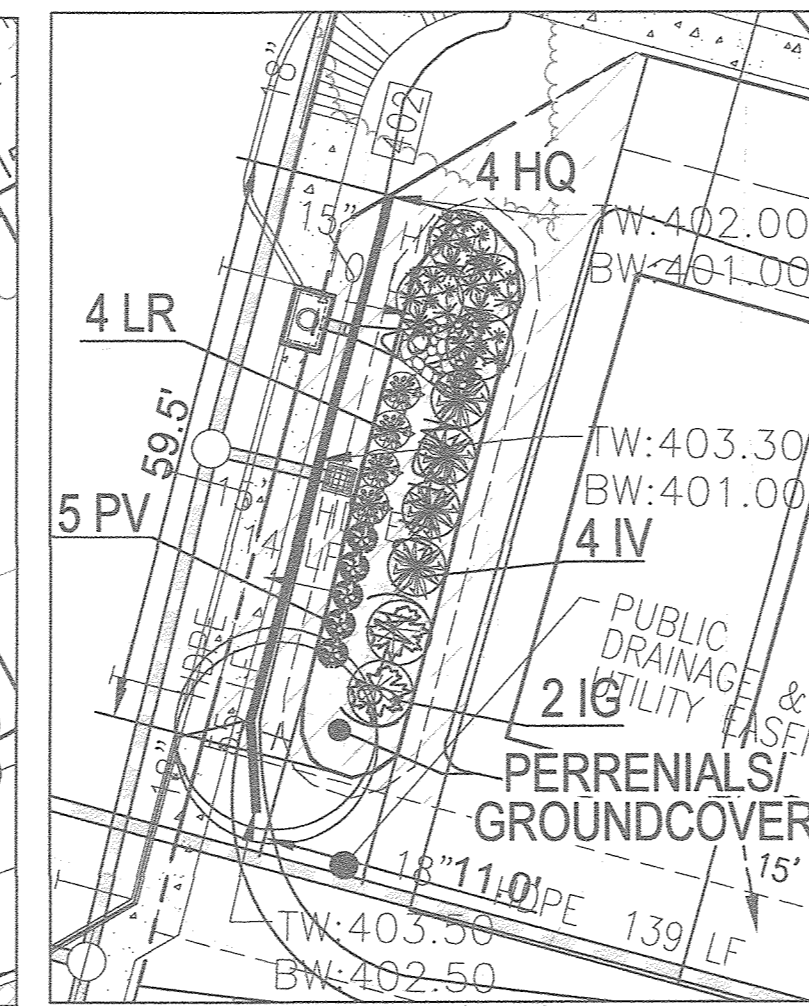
DETAILED BIO AND PLANTING PLAN (SWM #6)
